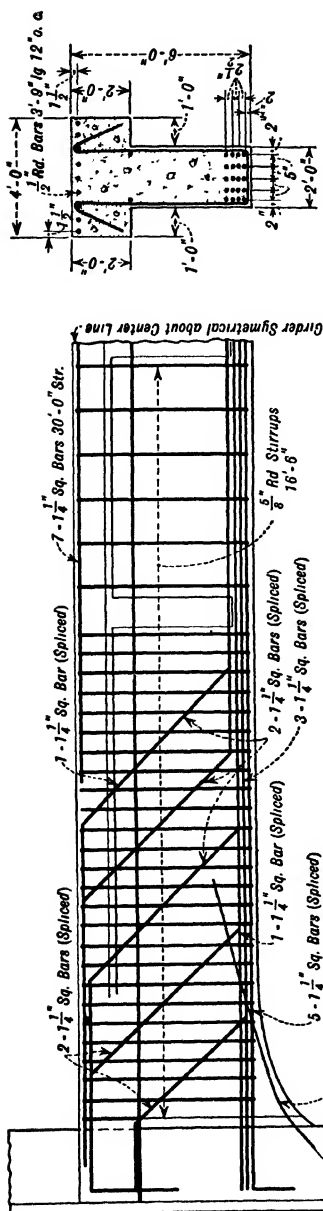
Details of First Balcony Fulcrum Girder. Winston-Salem, N. C., Auditorium. (See p. 784.)
